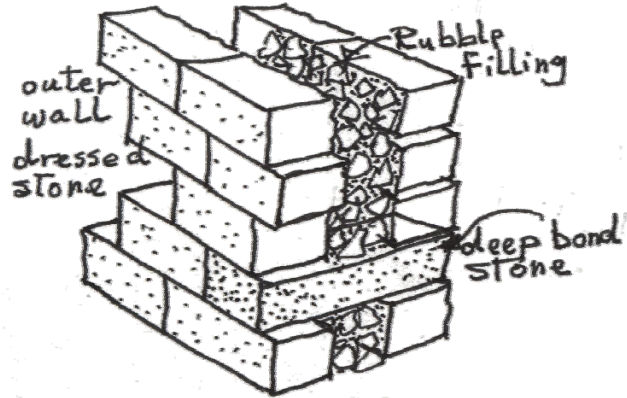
Sketch of a stone wall with 2 layers of dressed stones and an infill of rubble in the middle
